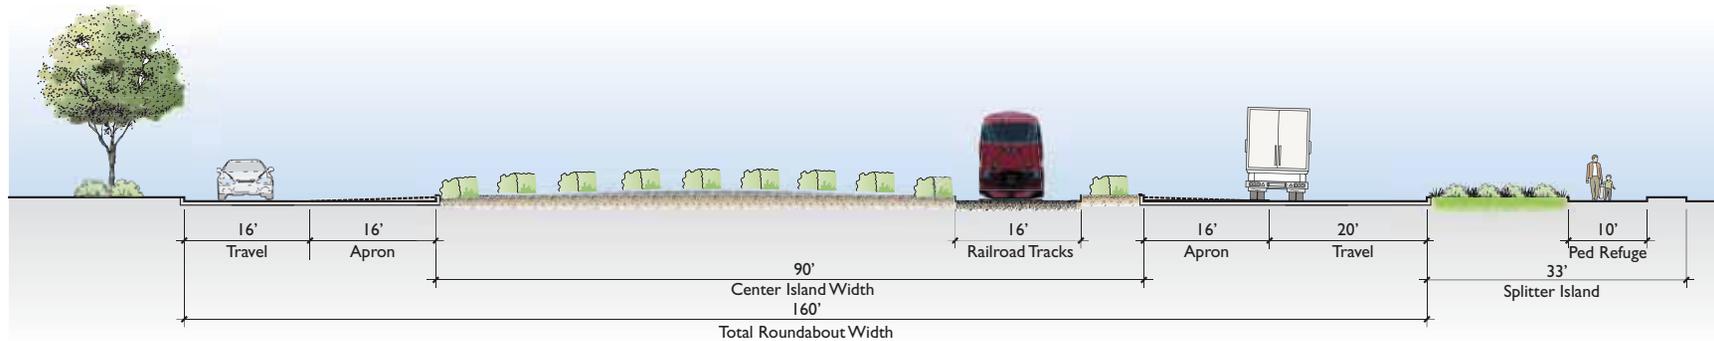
Section of Northern Roundabout, Looking Northwest
